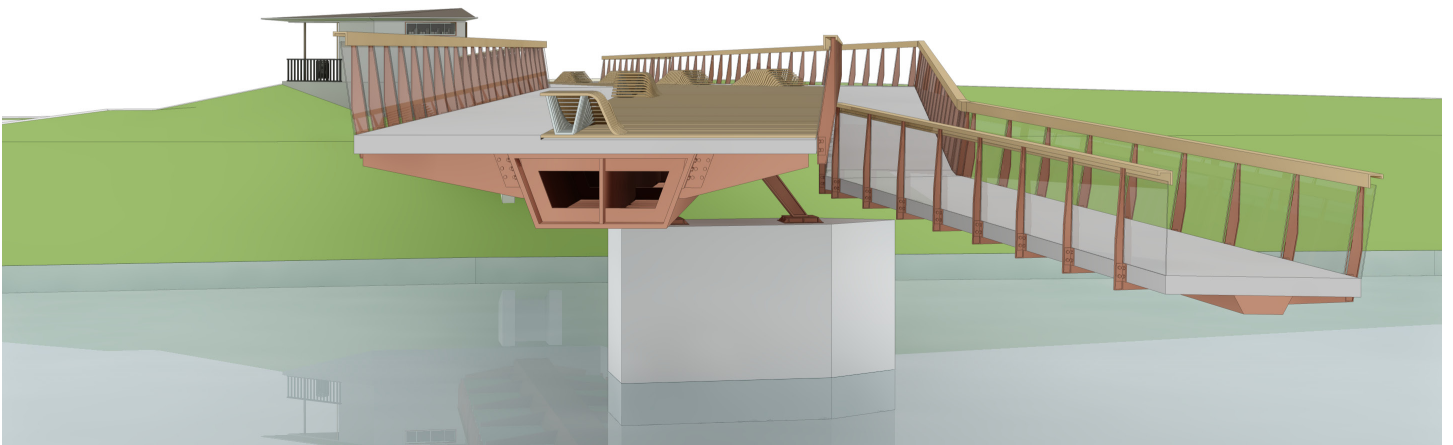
Section view showing the steel structure of the Market Bridge.
